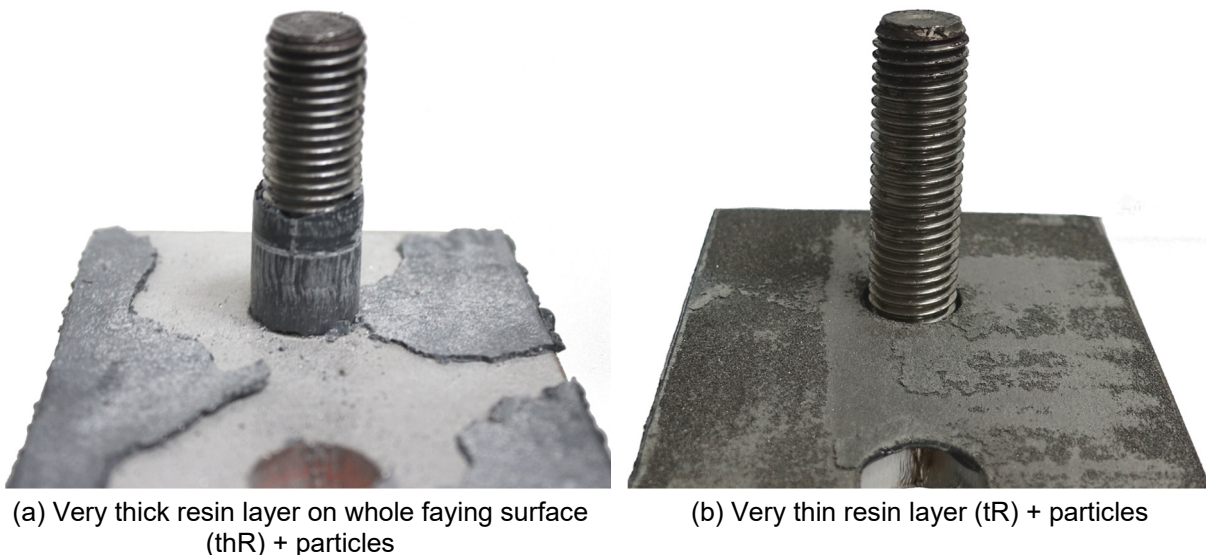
Schematic condition of the faying surfaces and hole clearance after bolt preloading
